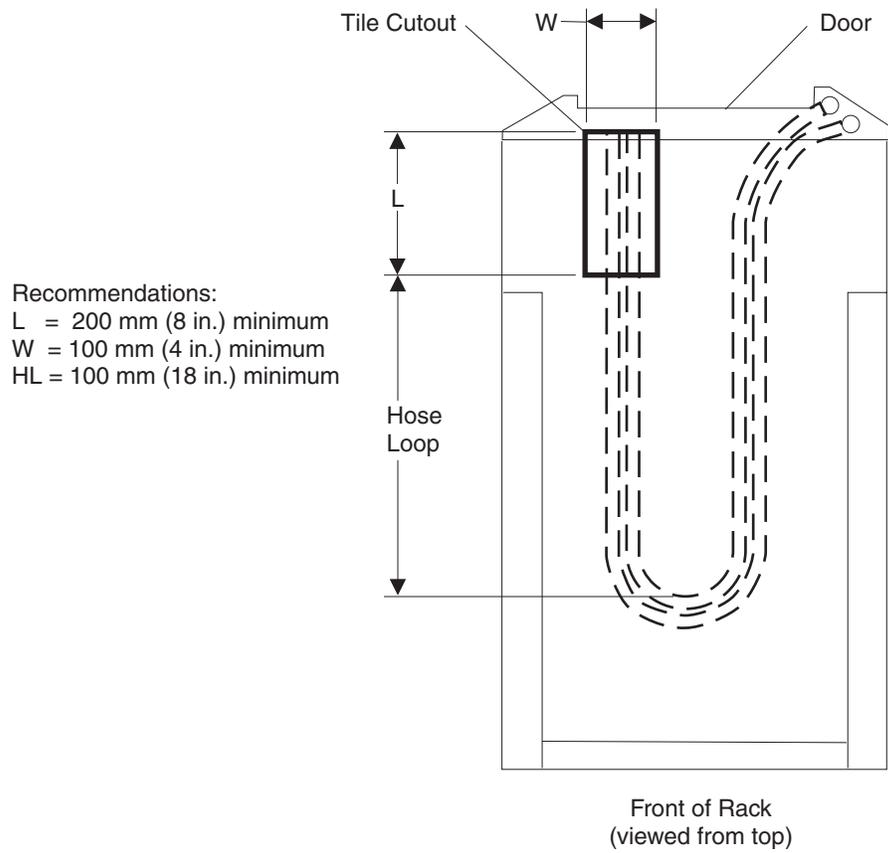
Raised floor and non-raised floor hose management example 2; loop under the rack with door closed
